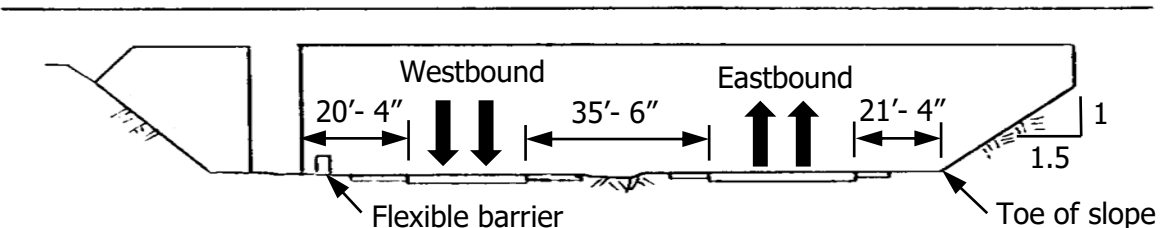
Bridge elevation view of horizontal clearances for separate westbound and eastbound highway features below the bridge, with flexible barrier.
